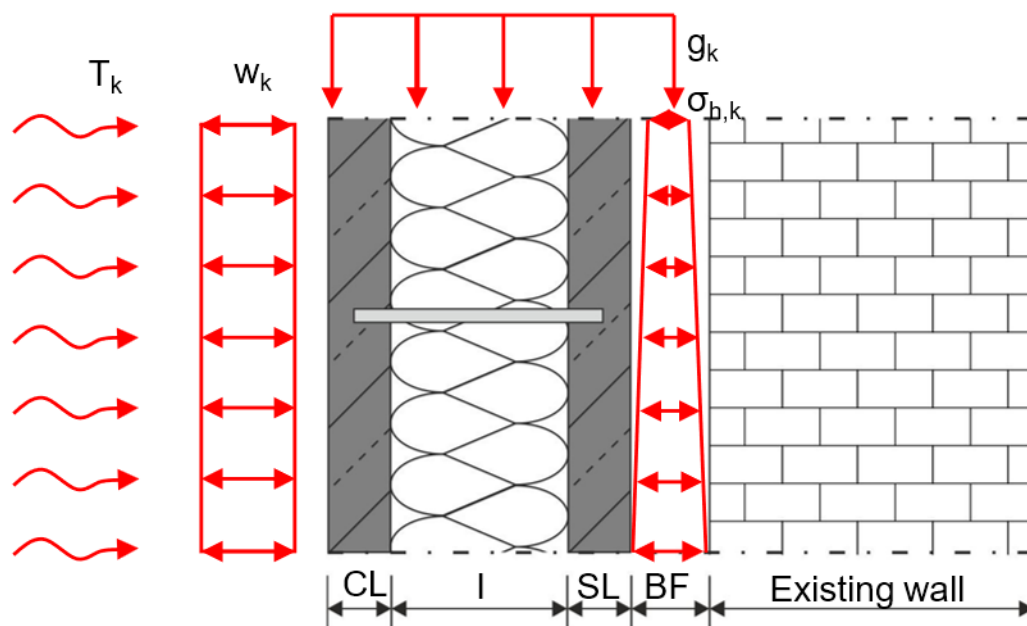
External actions on the sandwich façade element; CL: cover layer, I: insulation layer, SL: structural layer, BF: backfill.
